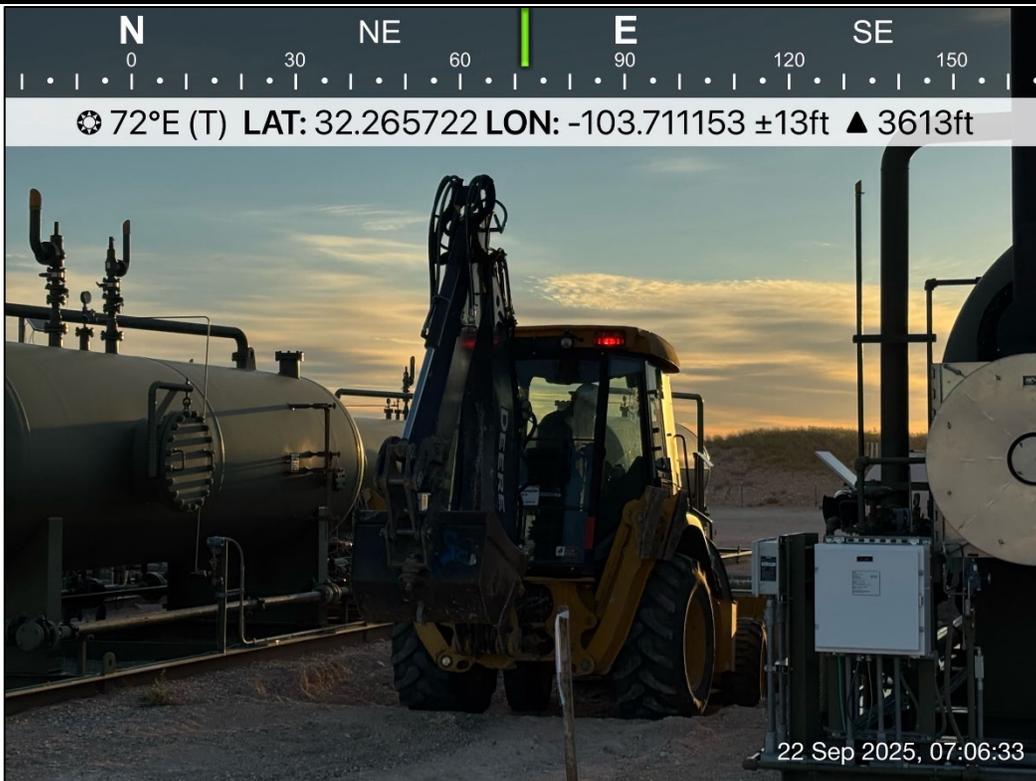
Northeastern view during excavation activities. 9/22/2025
